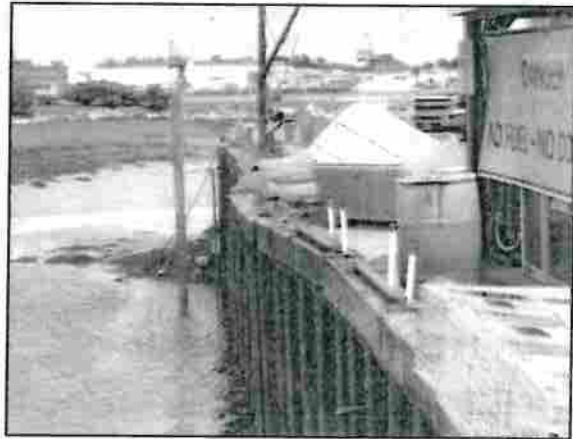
Visible deflection at the top of the wall (6/11/2019).
